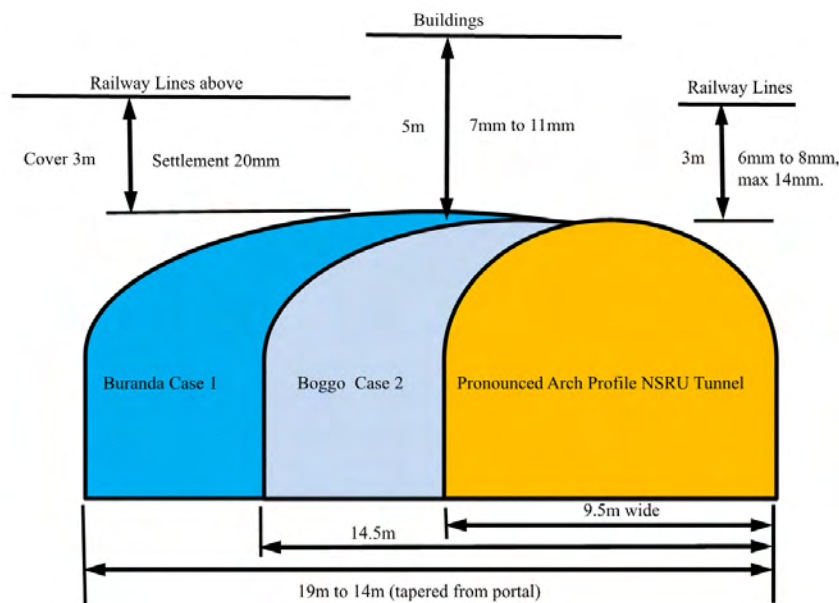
Comparing previous shallow cover tunnels with the NSRU tunnel.
